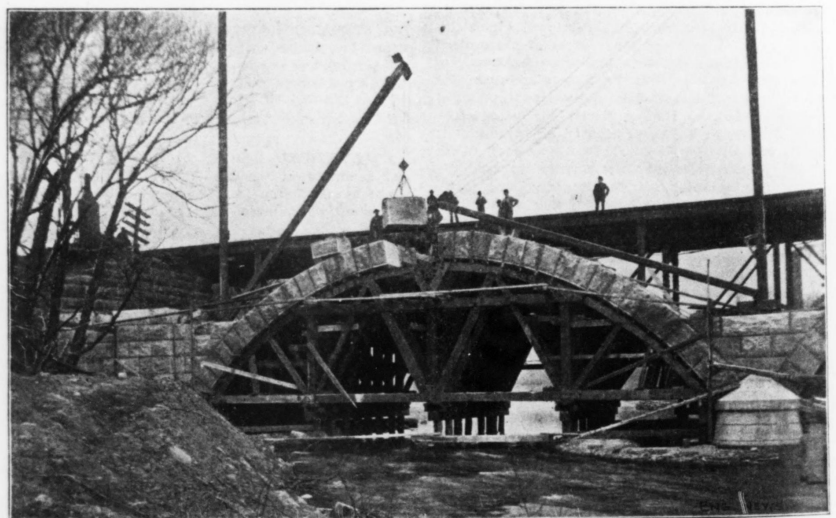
CONSTRUCTION OF THE STONE ARCH BRIDGE AT WATERTOWN, WIS.: C. M. & ST. P. RY.
